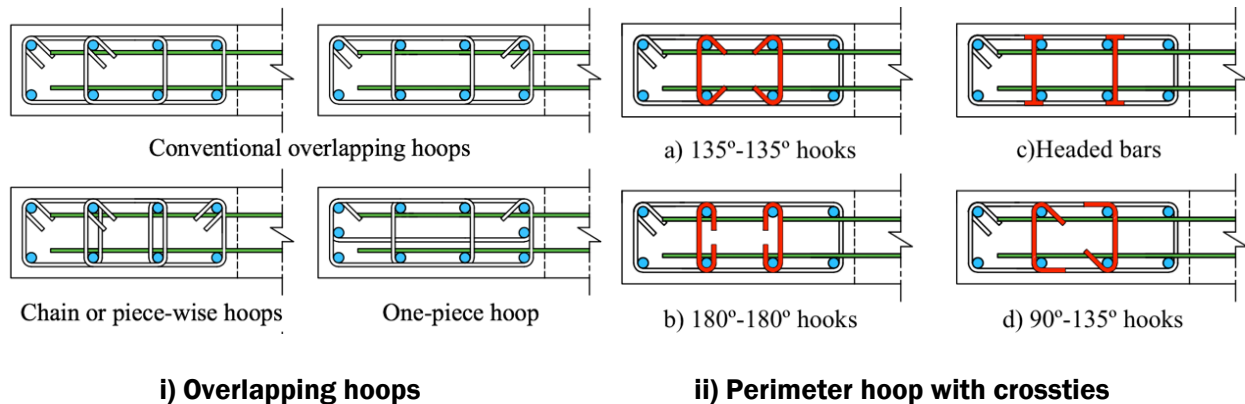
Examples of boundary transverse reinforcement configurations of conforming walls.
